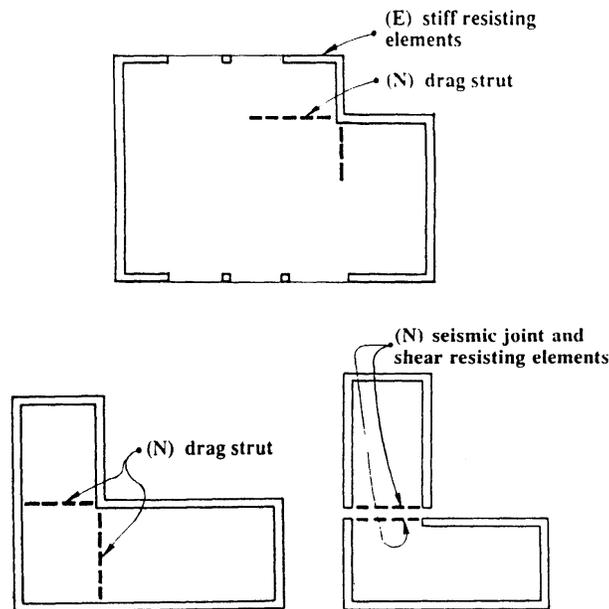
Horizontal or Plan Irregularities -- Rehabilitating Buildings With Re-entrant Corners
